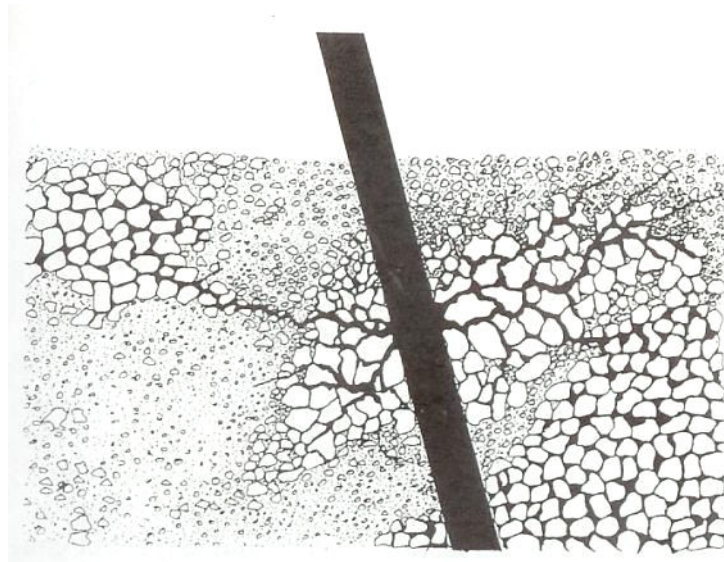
, Fracture grouting, after Houlby 1990 [7]
